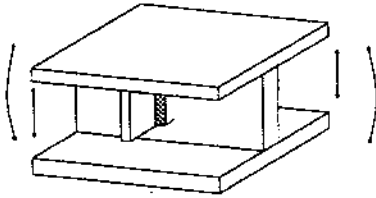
UKDEn Detail in Welded Girders 2
